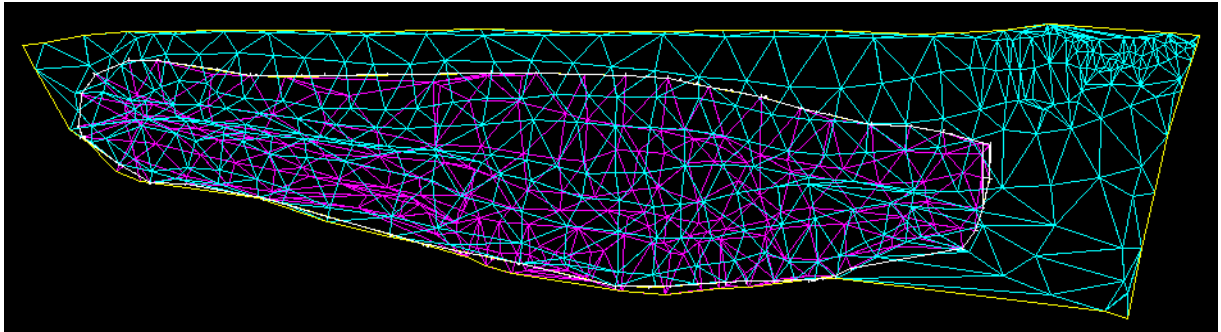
Plan View of Surfaces Used in Borrow Pit Earthwork Computations
